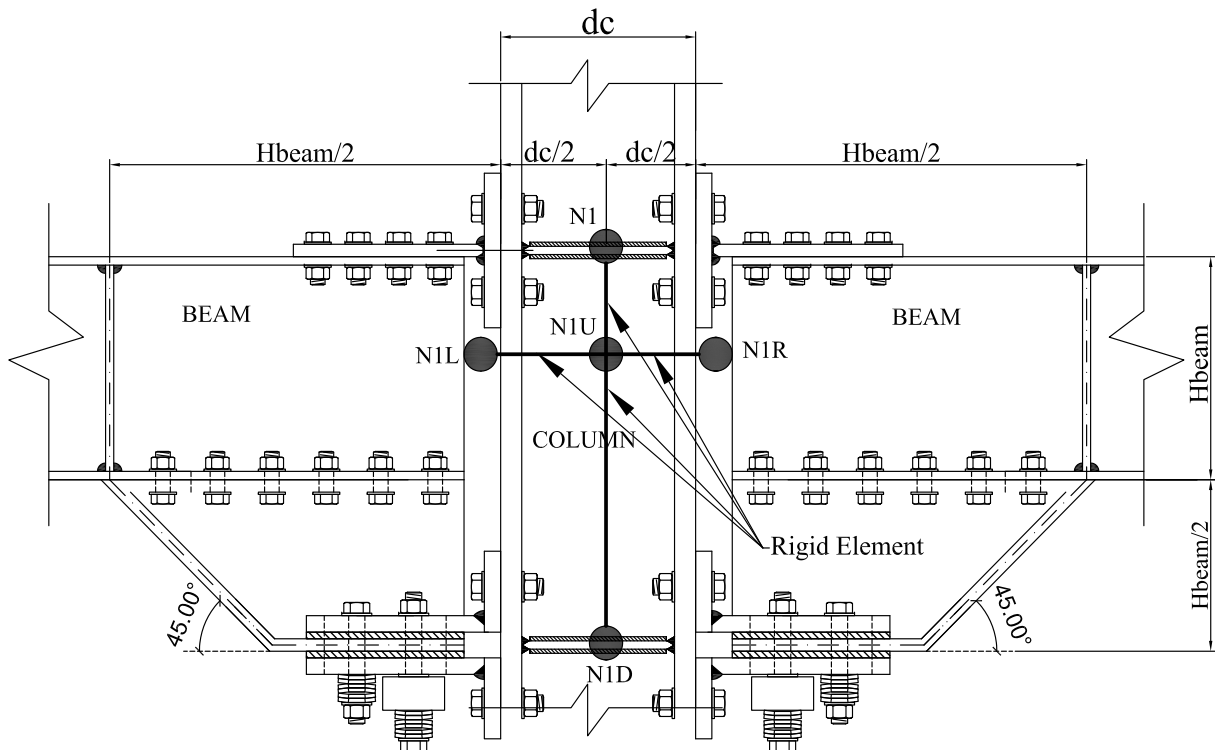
Scheme of a Rigid Beam-column connection for MRFs design with DP-A approach.
